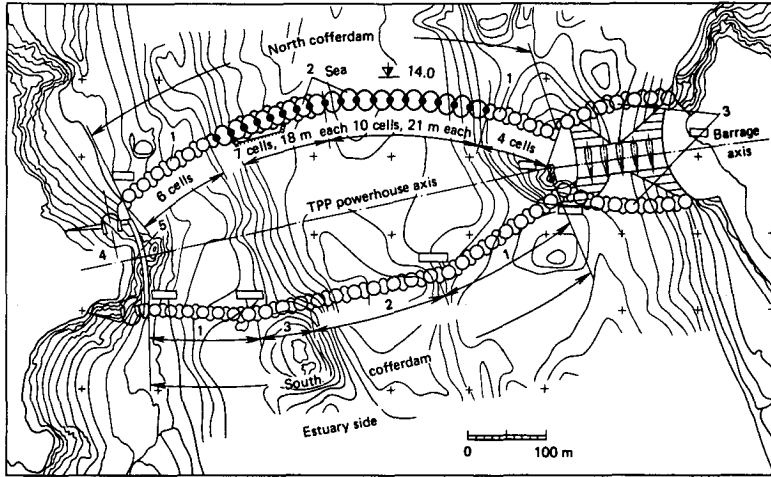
Plan of cofferdams: 1 - sheet-pile cells 19 m in dia; 2 - sheet-pile cells 21 m in dia supported by reinforced-concrete columns; 3 - cellular cofferdam; 4 - lock pit; 5 - concrete cofferdam with crest elevation of +7 m.
